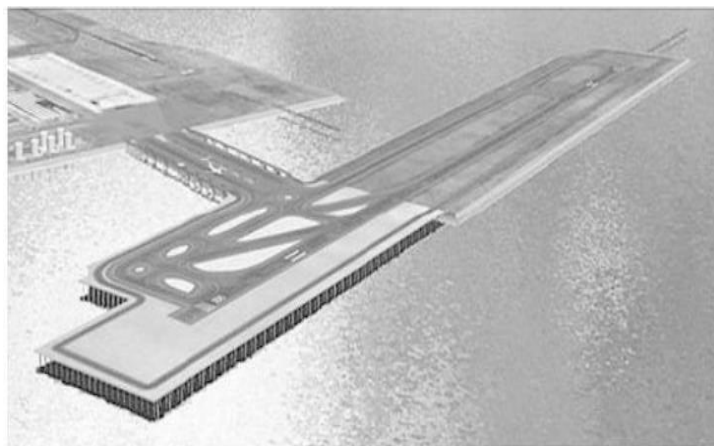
New Haneda Airport runway, Tokyo (Fehling et al.).
